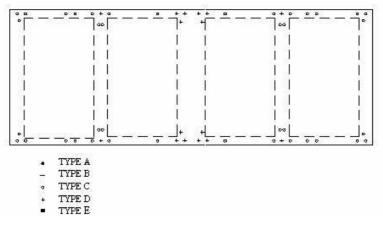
Location of Anchor Dowels in Specimen SP-7
